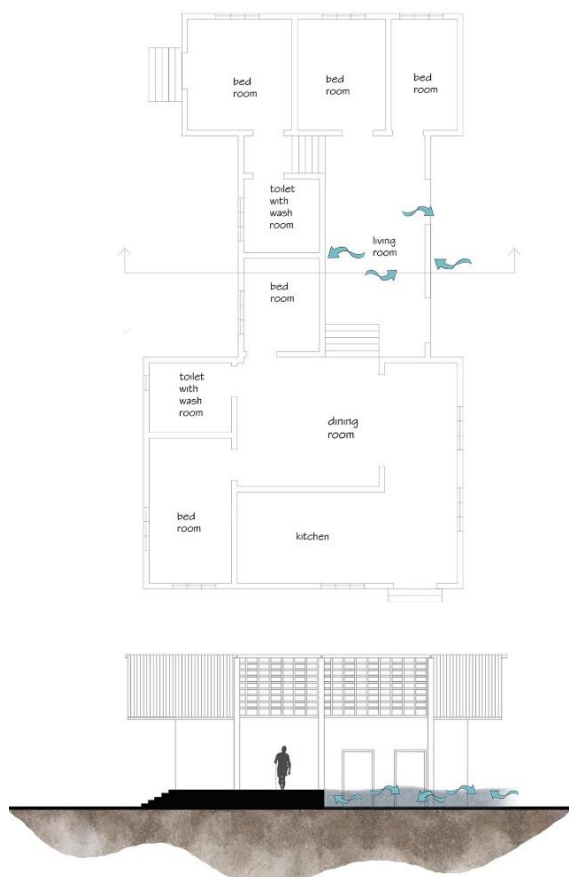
Floor Plan and Cross Section showing movement of flood water and level of inundation in Case 5 (Source: Henarangoda, 2020)
